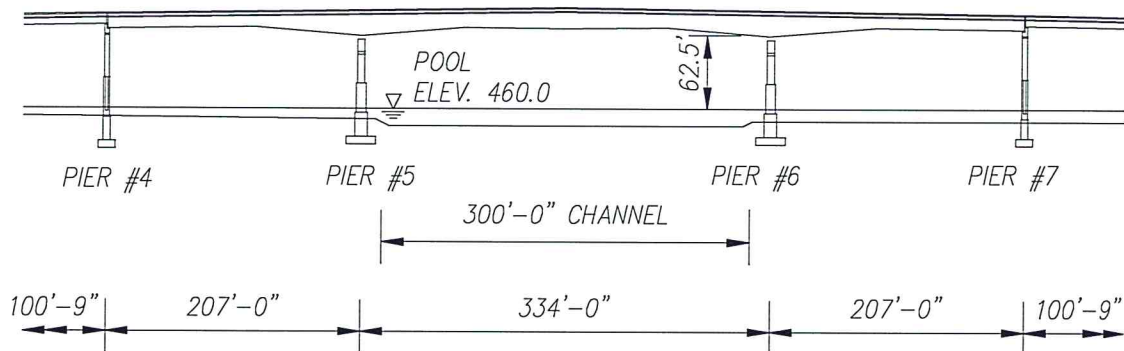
Elevation View of the Navigation Channel of the Bridge
